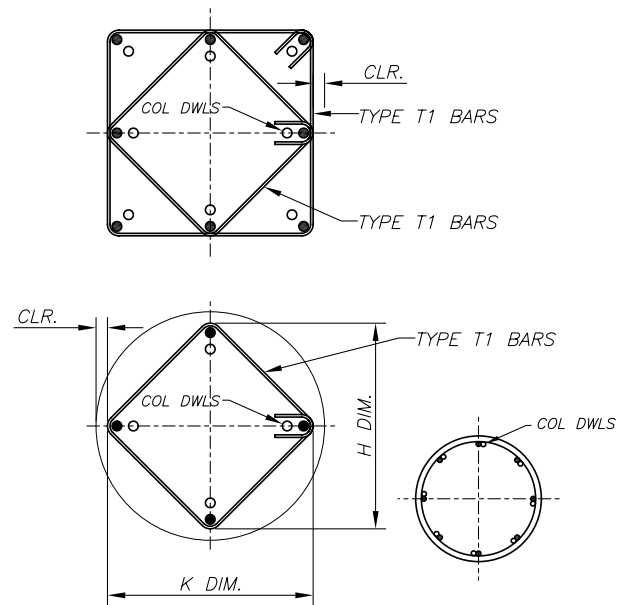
Typical sections at longitudinal bar splices in columns with rectangular ties. Typical vertical bar splice locations in a circular column with circular ties or spiral are shown for reference. Bar types are per Reference 3
